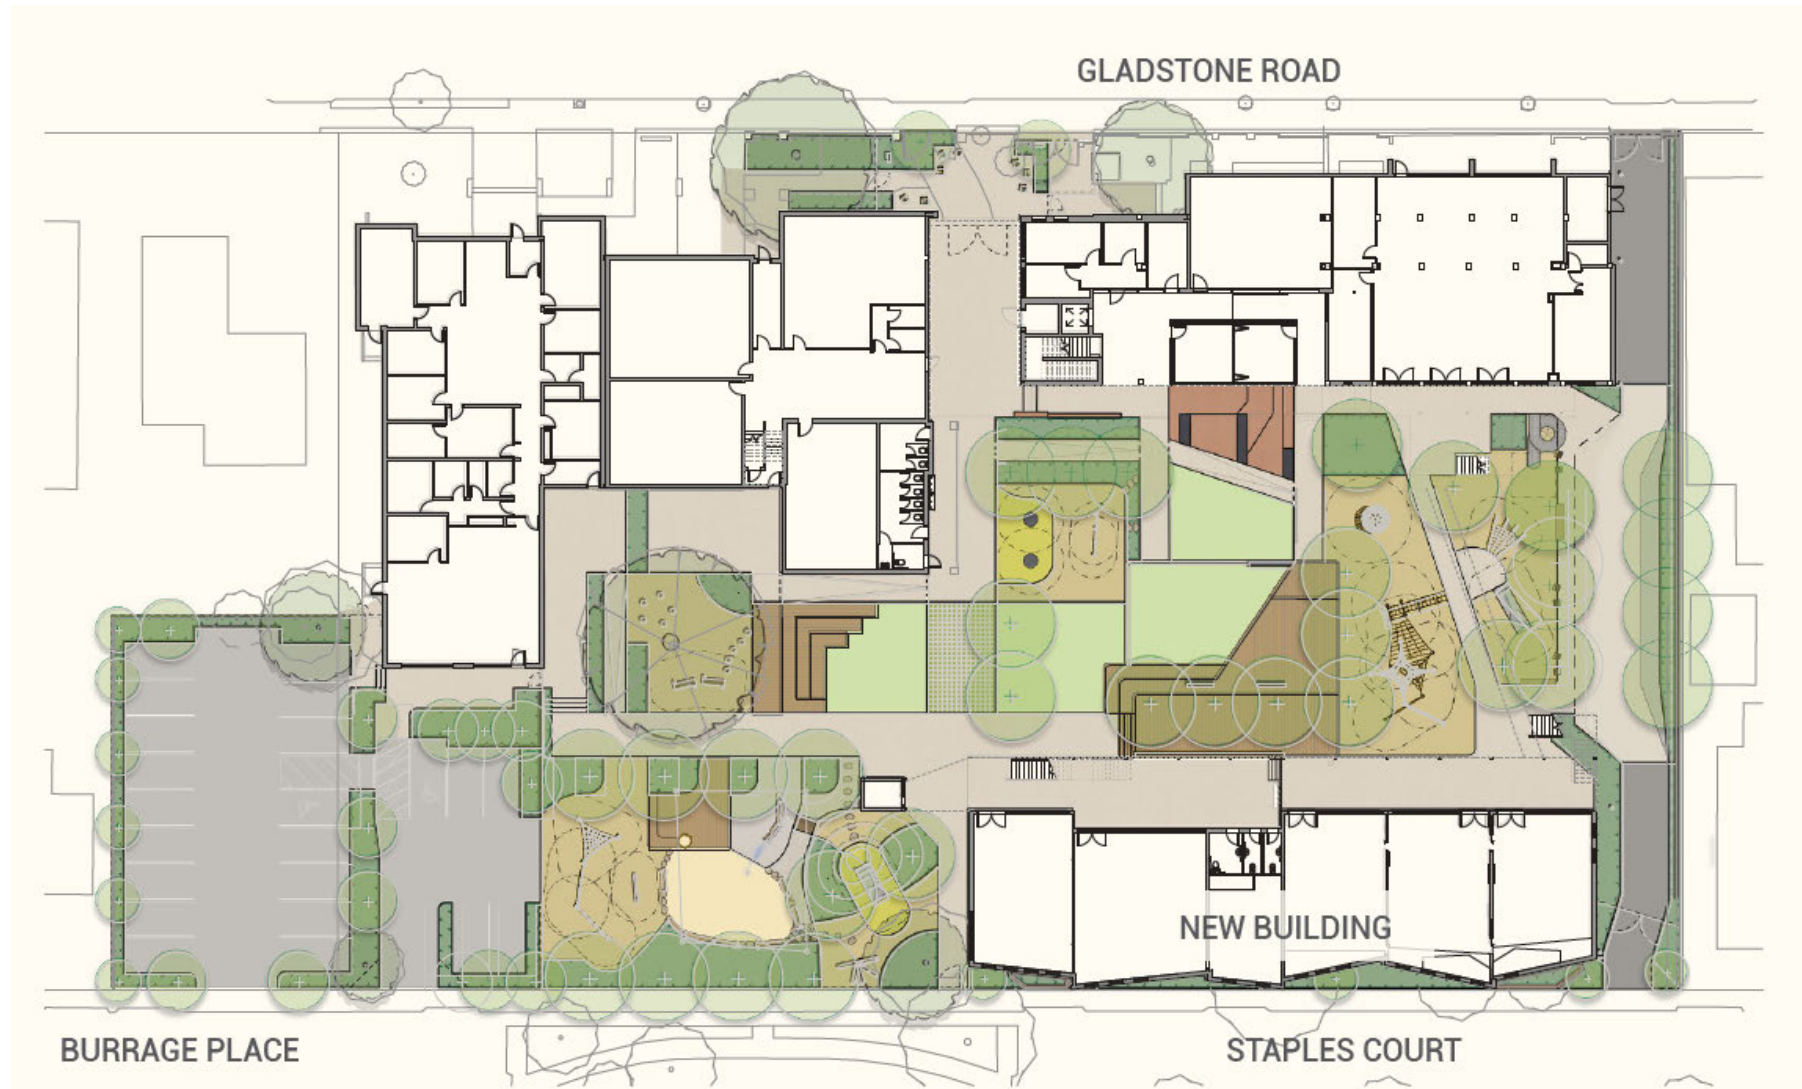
'Rosary School Proposed Development, Information Sheet, proposed site plan, provided September 2022
